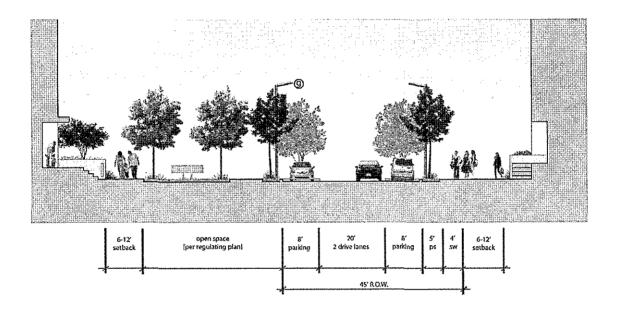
EXHIBIT ___F (Page 5 of 8) Streetscape Standards
